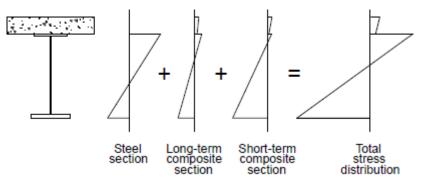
Summation of stresses acting on different resisting cross sections (Composite highway bridge design, 2010)
